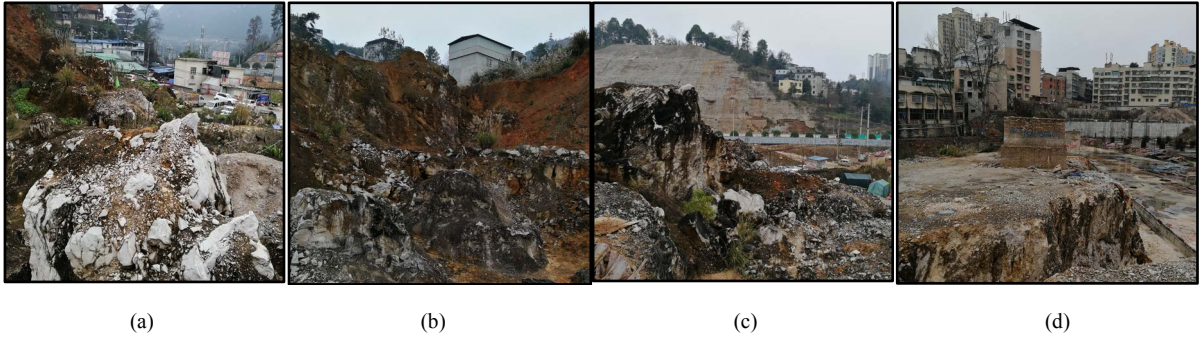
Photos of surrounding environment of foundation pit; (a) East side; (b) Northeast side; (c) South side; (d) West side
